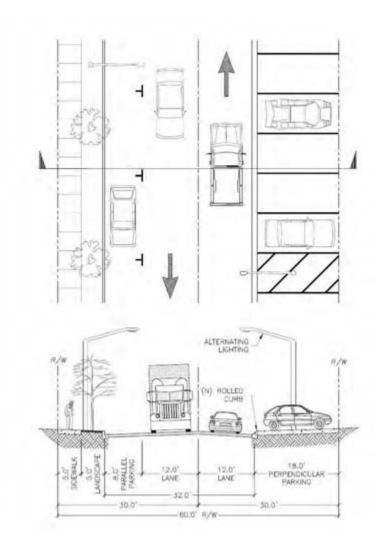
Typical 60' Right-of-Way Plan/Section with Perpendicular Parking
